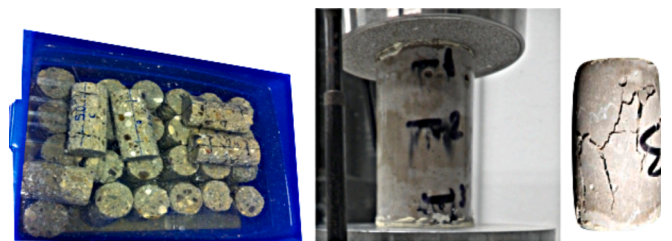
Concrete specimens placed in brine water (left), unconfined compressive tests (middle), and concrete after testing (right).
